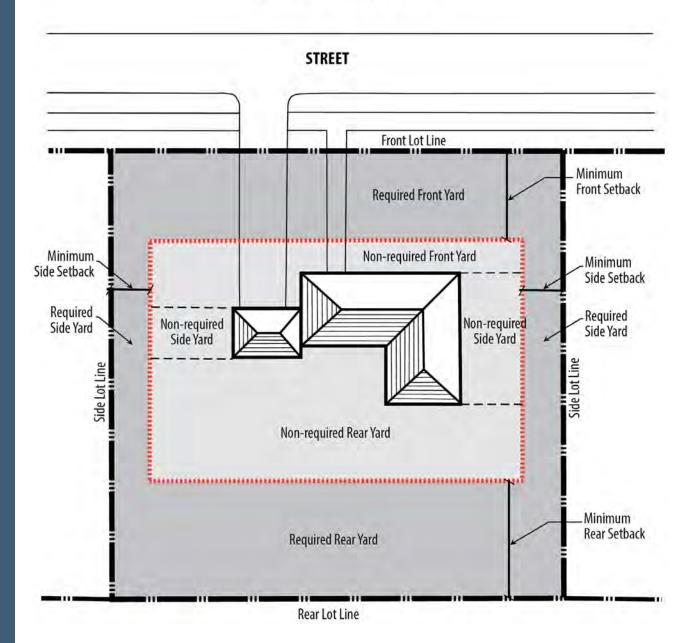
L. INTERIOR LOT LAYOUT
